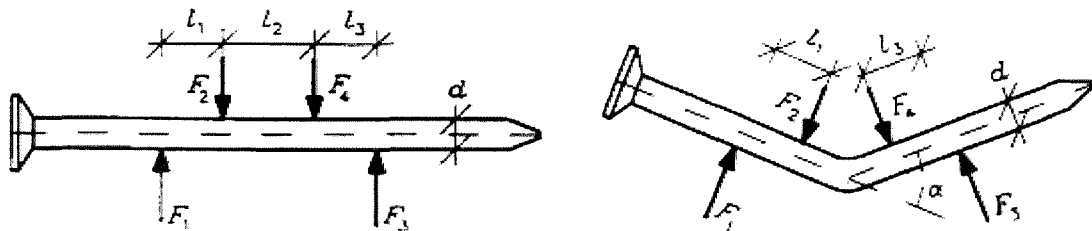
Loading and deformation of the fixing (BS EN 409:1993)
